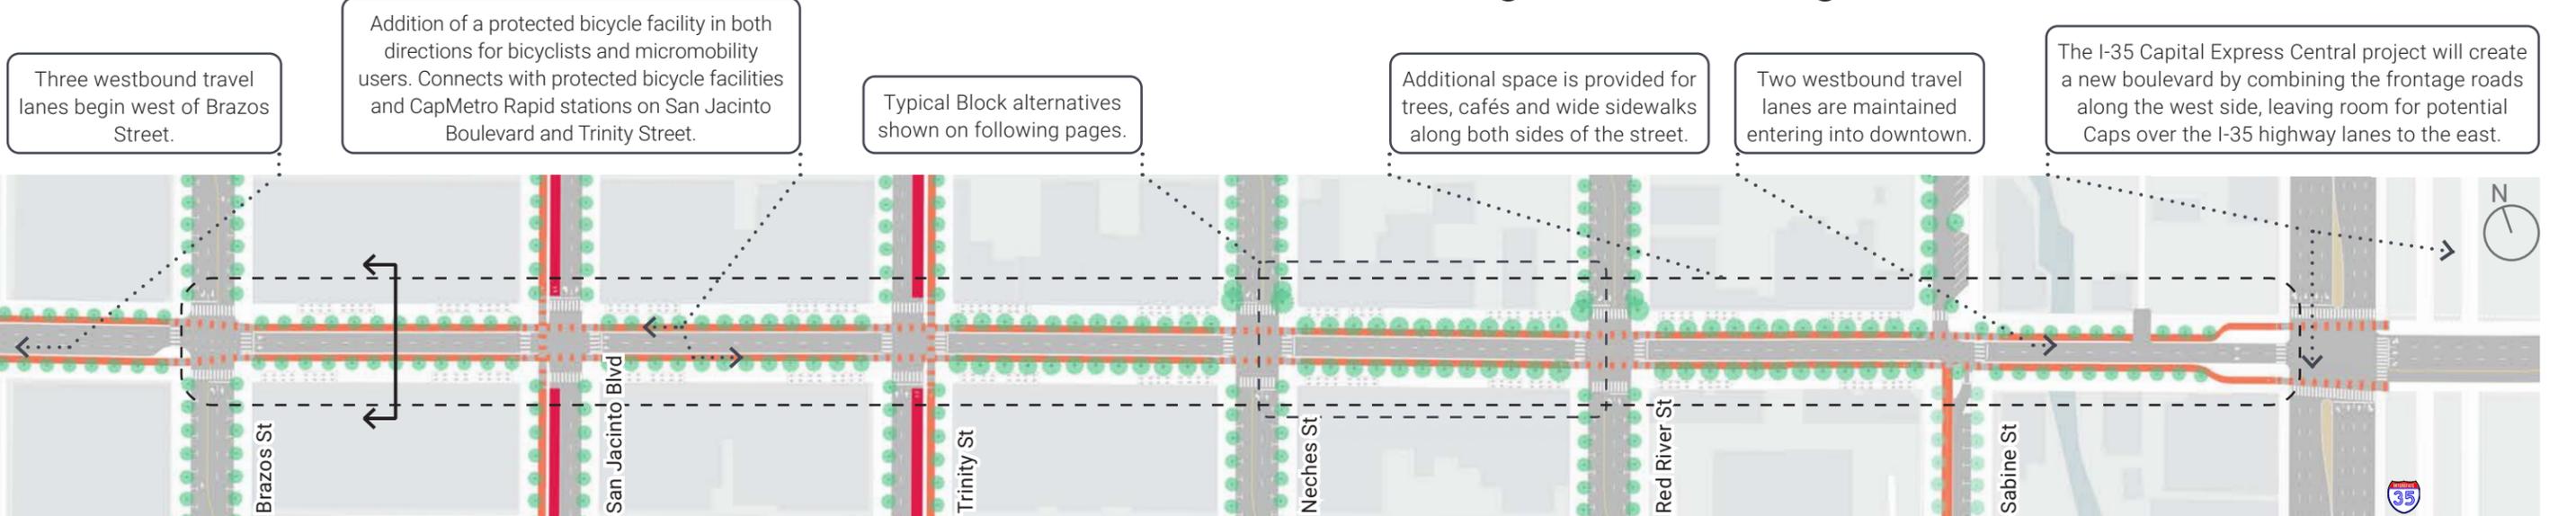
Sixth Street schematic I-35 to Brazos Street
